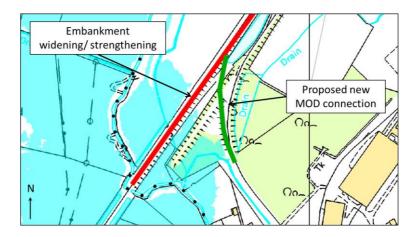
Location of embankment strengthening works and proposed new connection to MOD site
